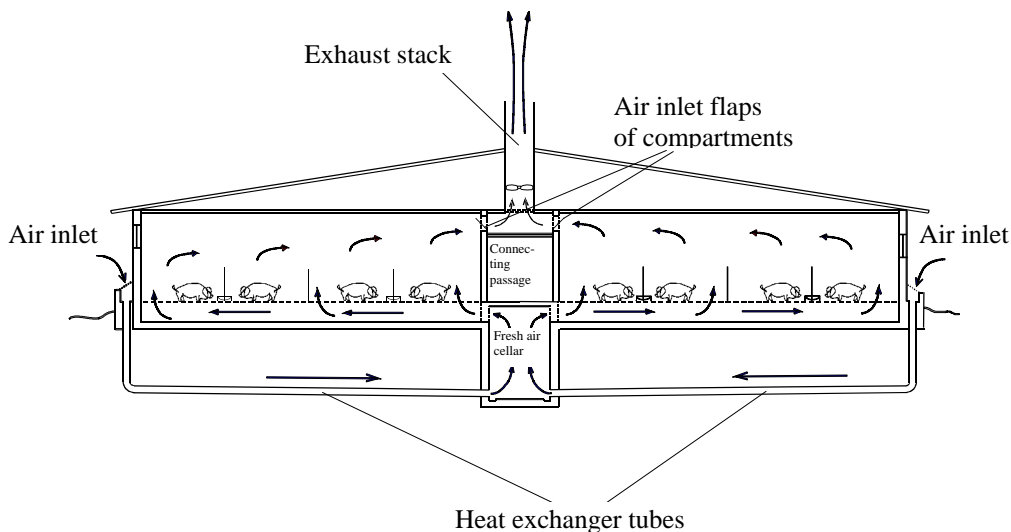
Cross section of a house for fattening pigs – forced ventilation connected with a geothermal heat exchanger
